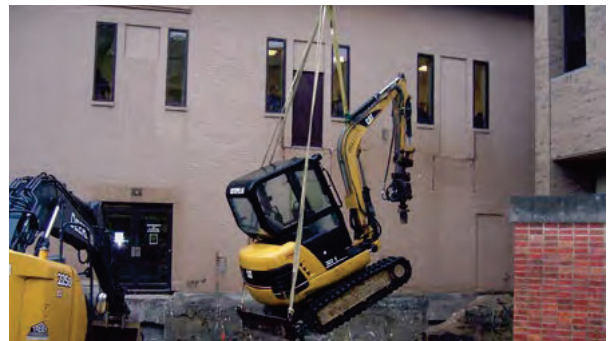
Mini-excavator lowered by crane into excavation to install helical tiebacks
